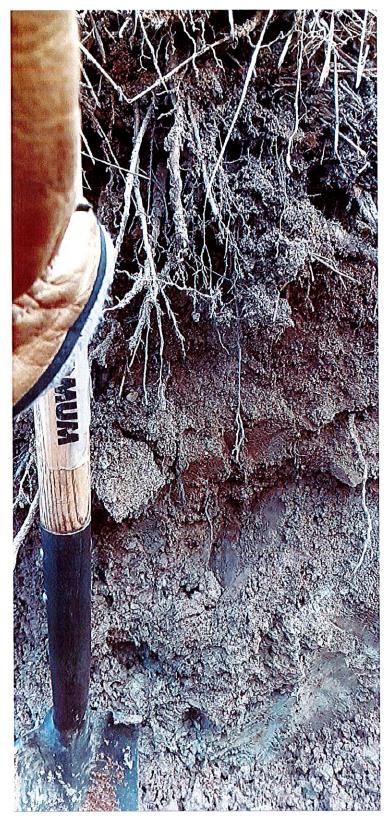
Test Pit 6 showing varved silt and clay near surface
